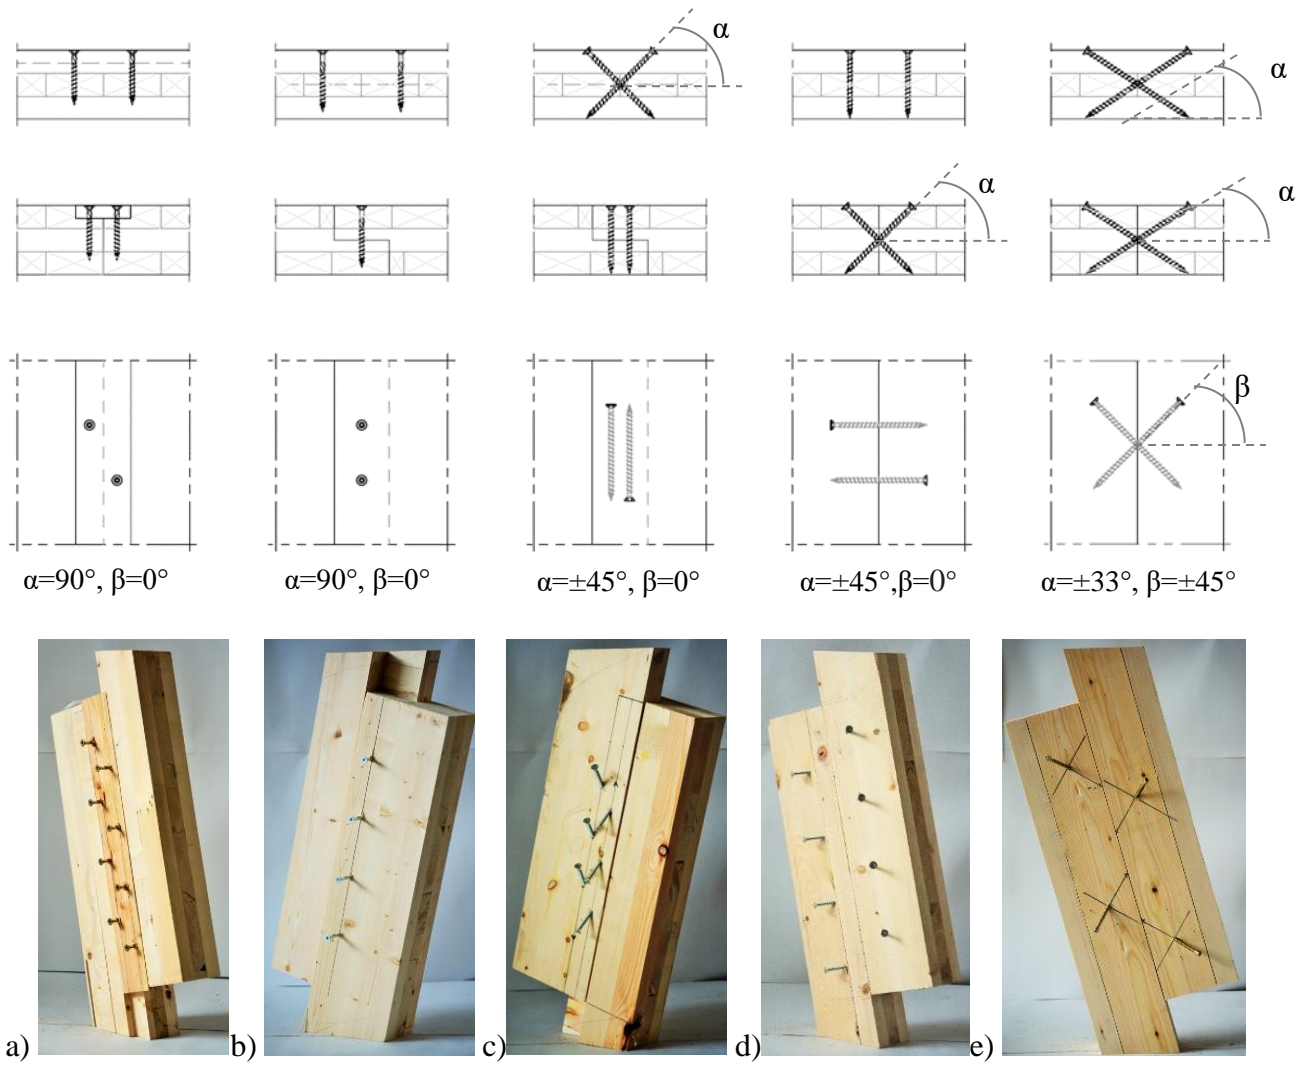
Joint specimen layout : a) spline joint with STS in shear, b) lap joint with STS in shear, c) lap joint with STS in withdrawal, d) butt joint with STS in shear, e) butt joint with STS in withdrawal
